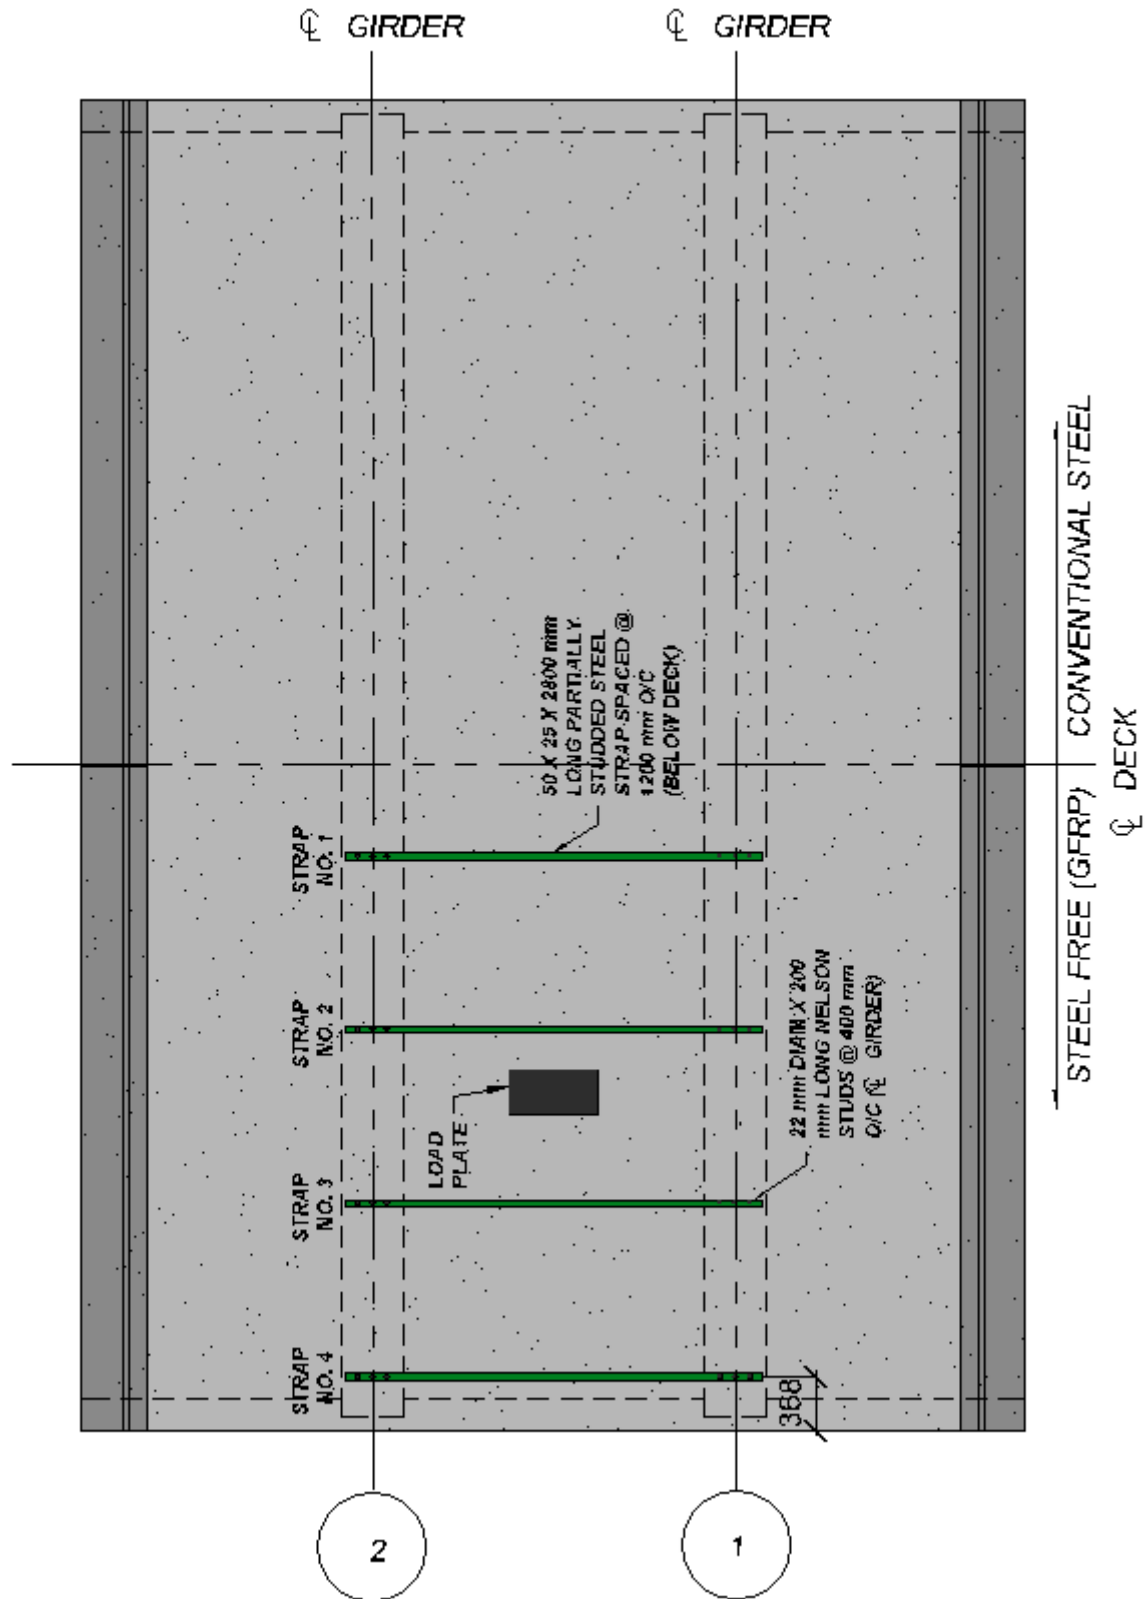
Plan view of concrete bridge deck slab with bottom external reinforcement schematic (steel-free only) used in this experiment
